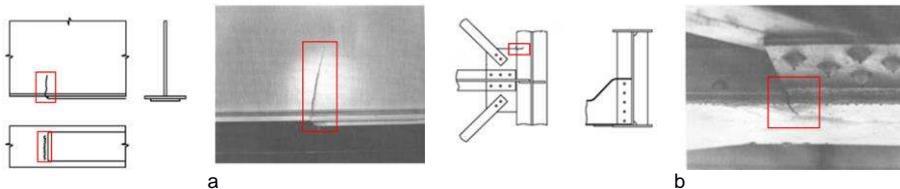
a) Fatigue crack at the end of a welded steel plate; b) crack in a difficult-to-reach area of a gusset
